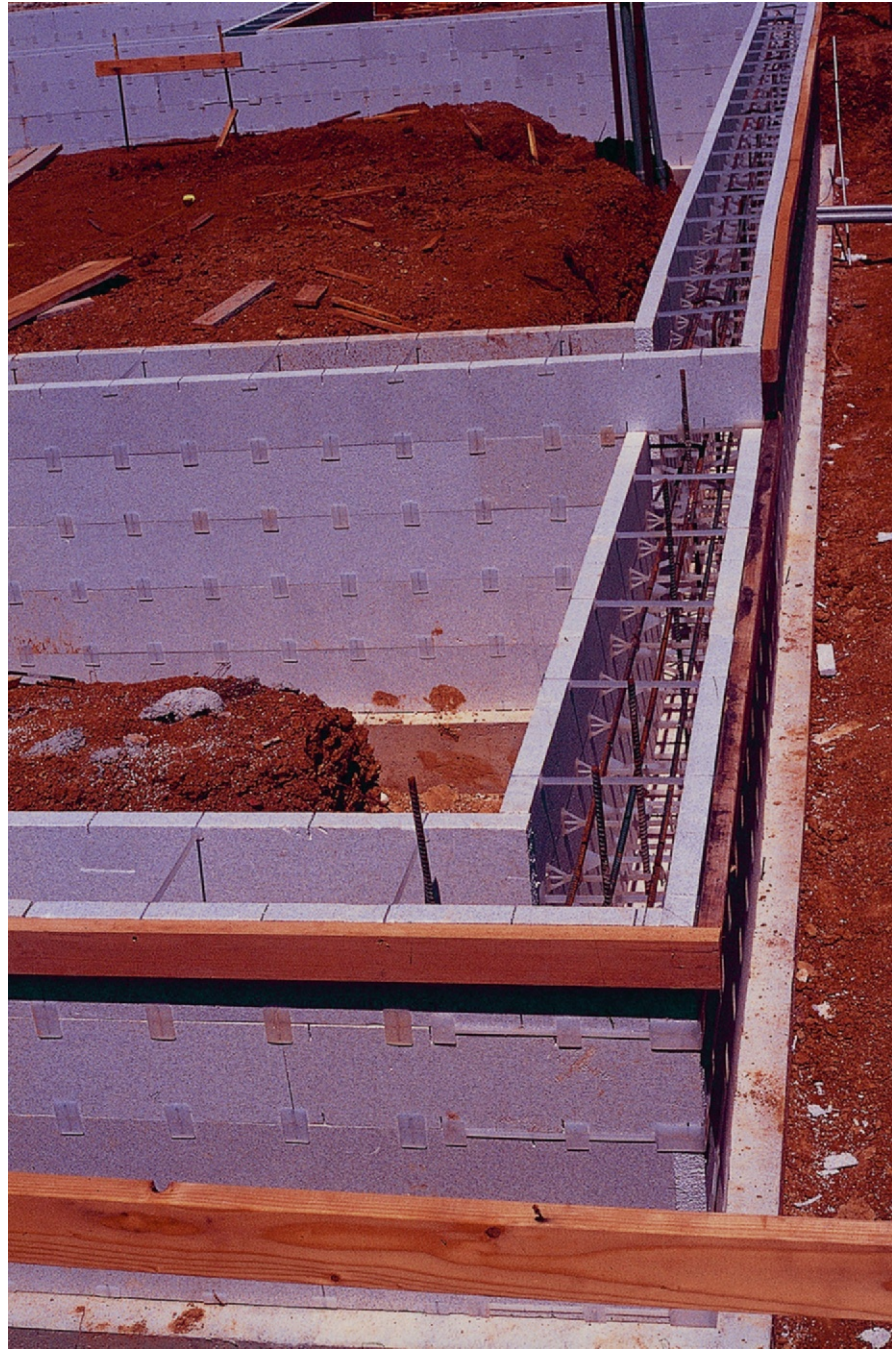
Insulating concrete forms (ICF) serve as both formwork and permanent insulation. Although mostly used for foundations, the forms are also used to build above-grade walls.
